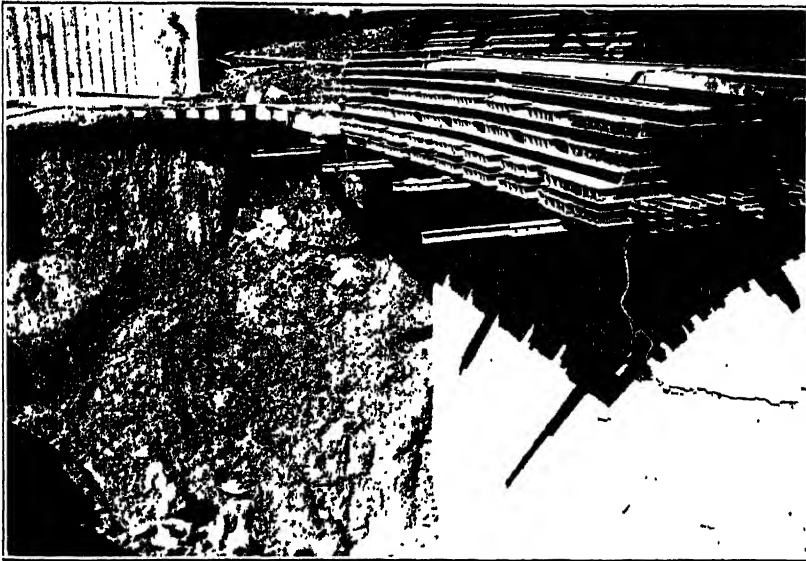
WEST SIDE OF MAIN SHAFT, LOADED AND EXCAVATED FOR 40 FT.
